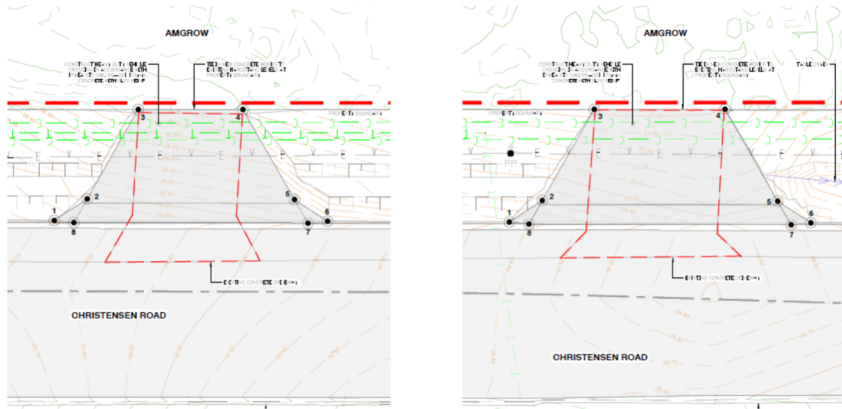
CONCEPT DESIGN OF THE PROPOSED SITE ACCESS / CHRISTENSEN ROAD INTERSECTION
